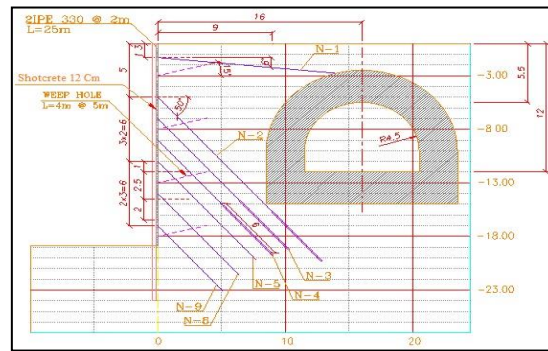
Typical section of the excavation of Sharif University Parking adjacent to the tunnel (case study).
